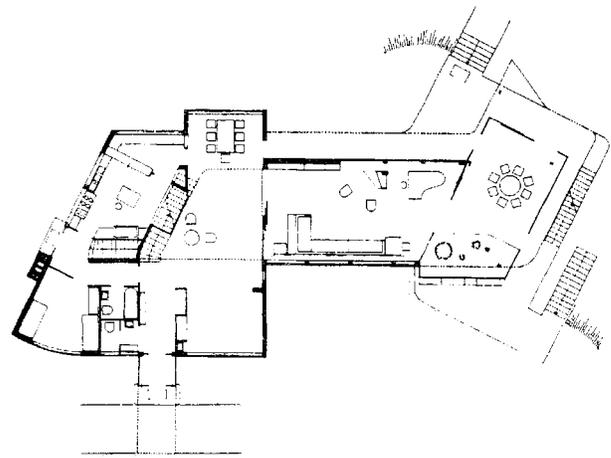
Hans Scharoun, Schminke House, Lobau, Saxony, 1933, ground floor plan.
